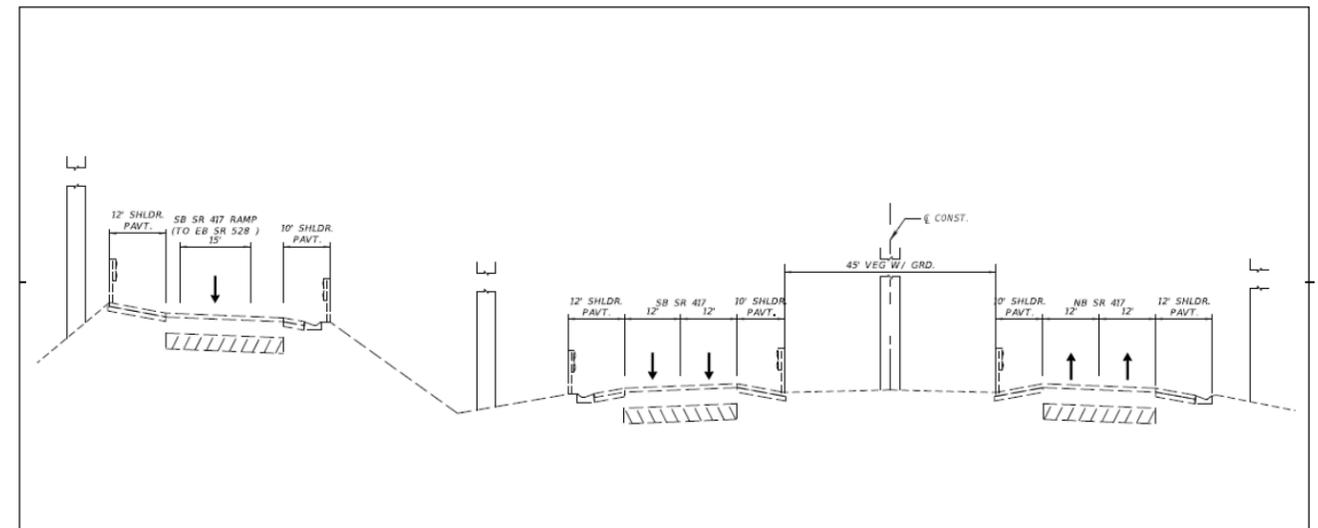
Typical Section at SR 417 Underpass at SR 528 (Structure #750374)
